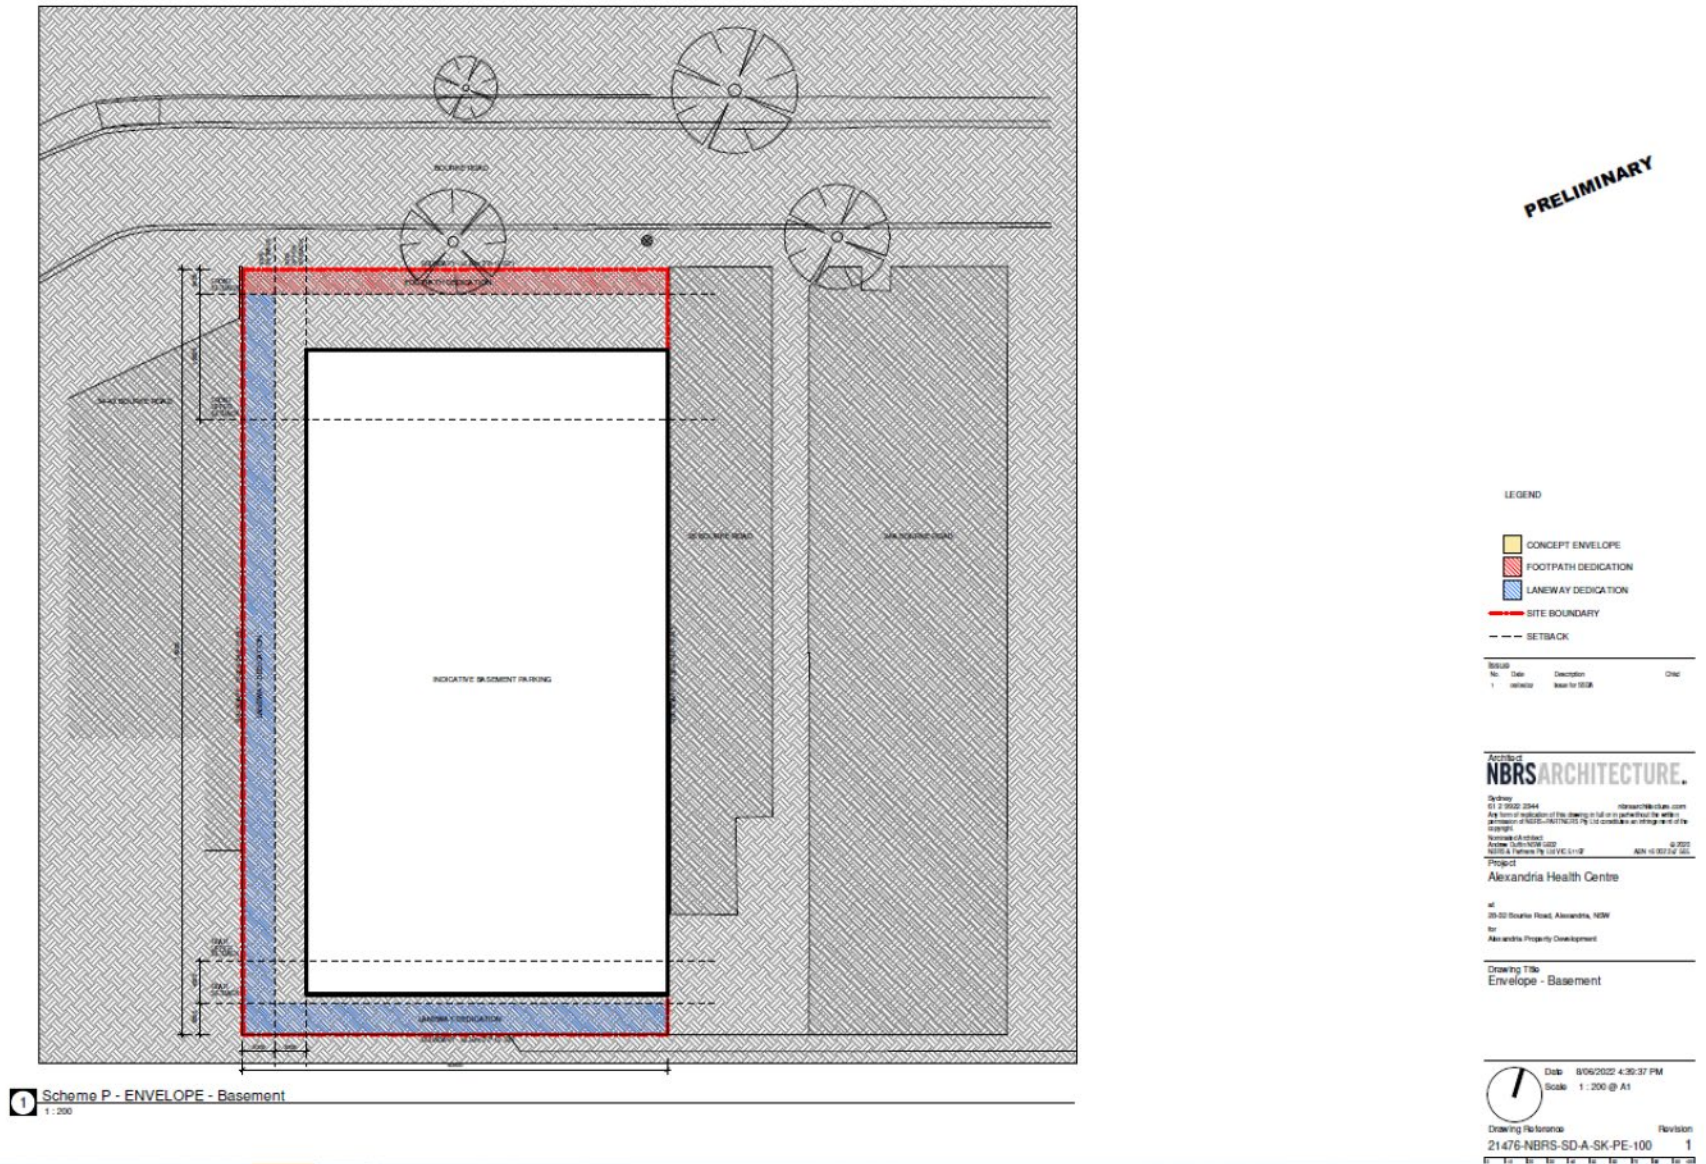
Site plan showing concept design of the basement level that is subject to a design competition and Stage 2 detailed SSD.
